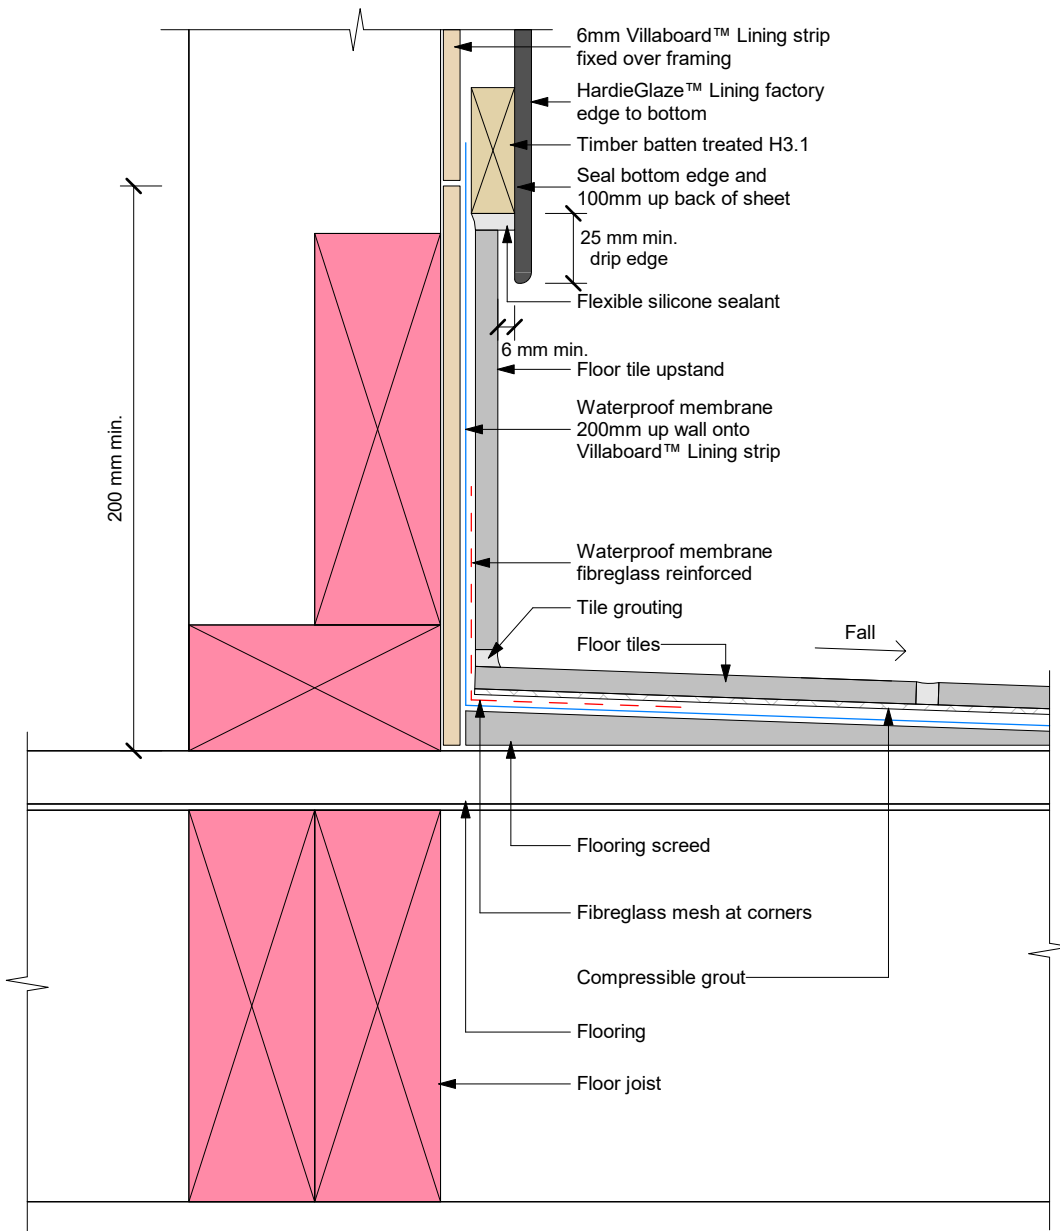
Hardie™ Glaze Lining wall to tiled floor
